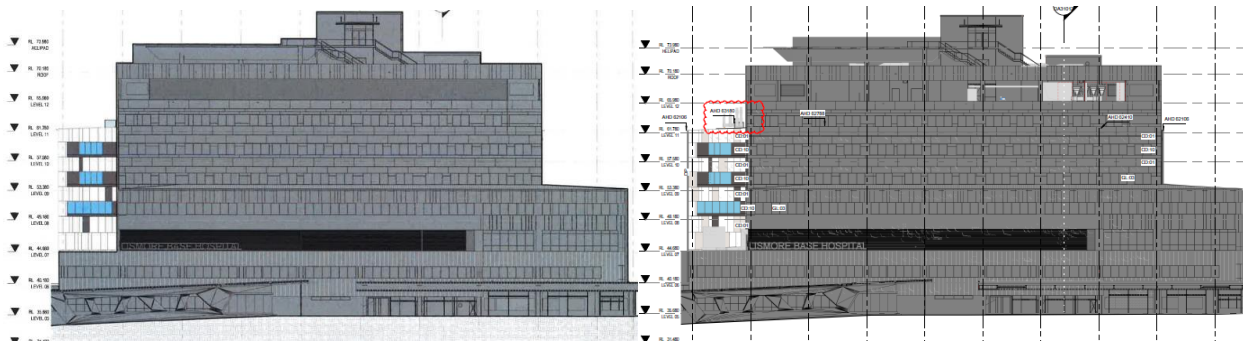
Approved vs Proposed Amended Southern Elevation Plans (Source: CGA)
